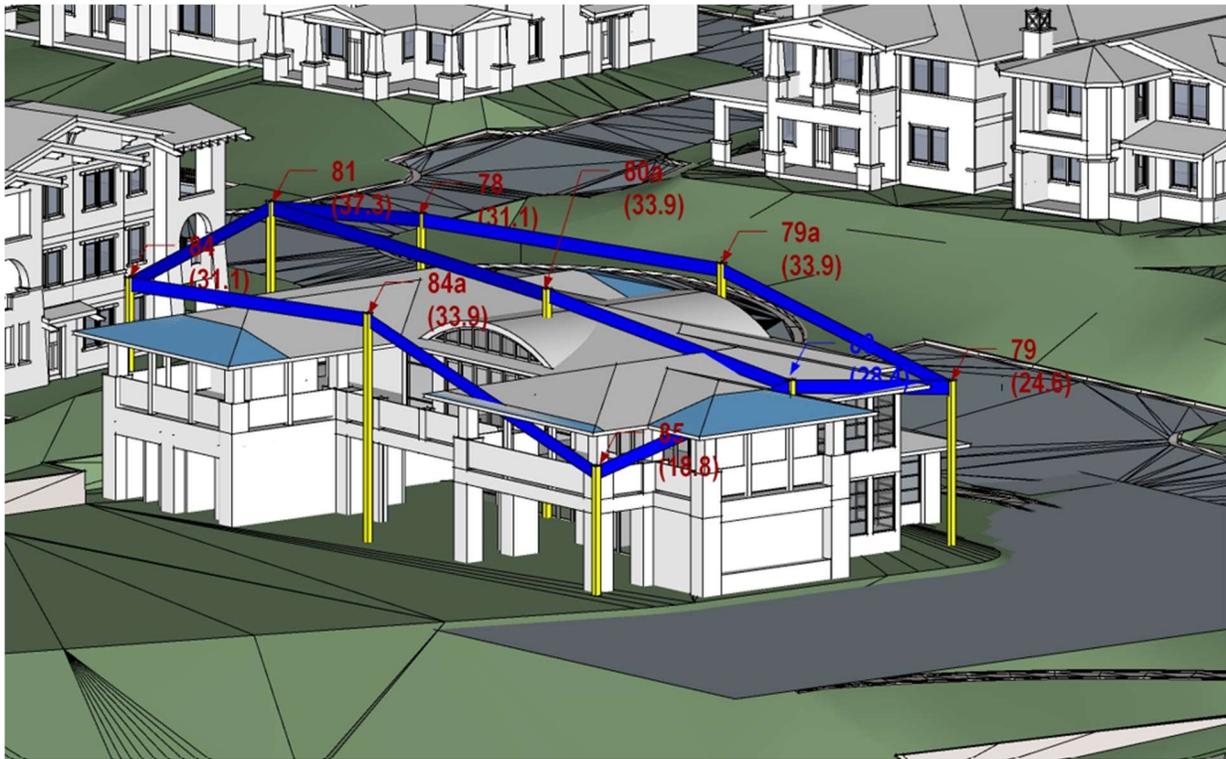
View to the northwest (Street Side and Rear Elevations)
